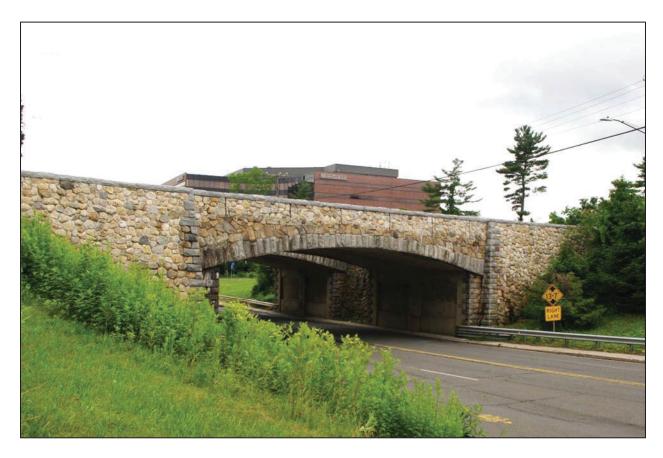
Merritt Parkway between Perry Avenue and the Route 7 interchange, camera facing northeast.
